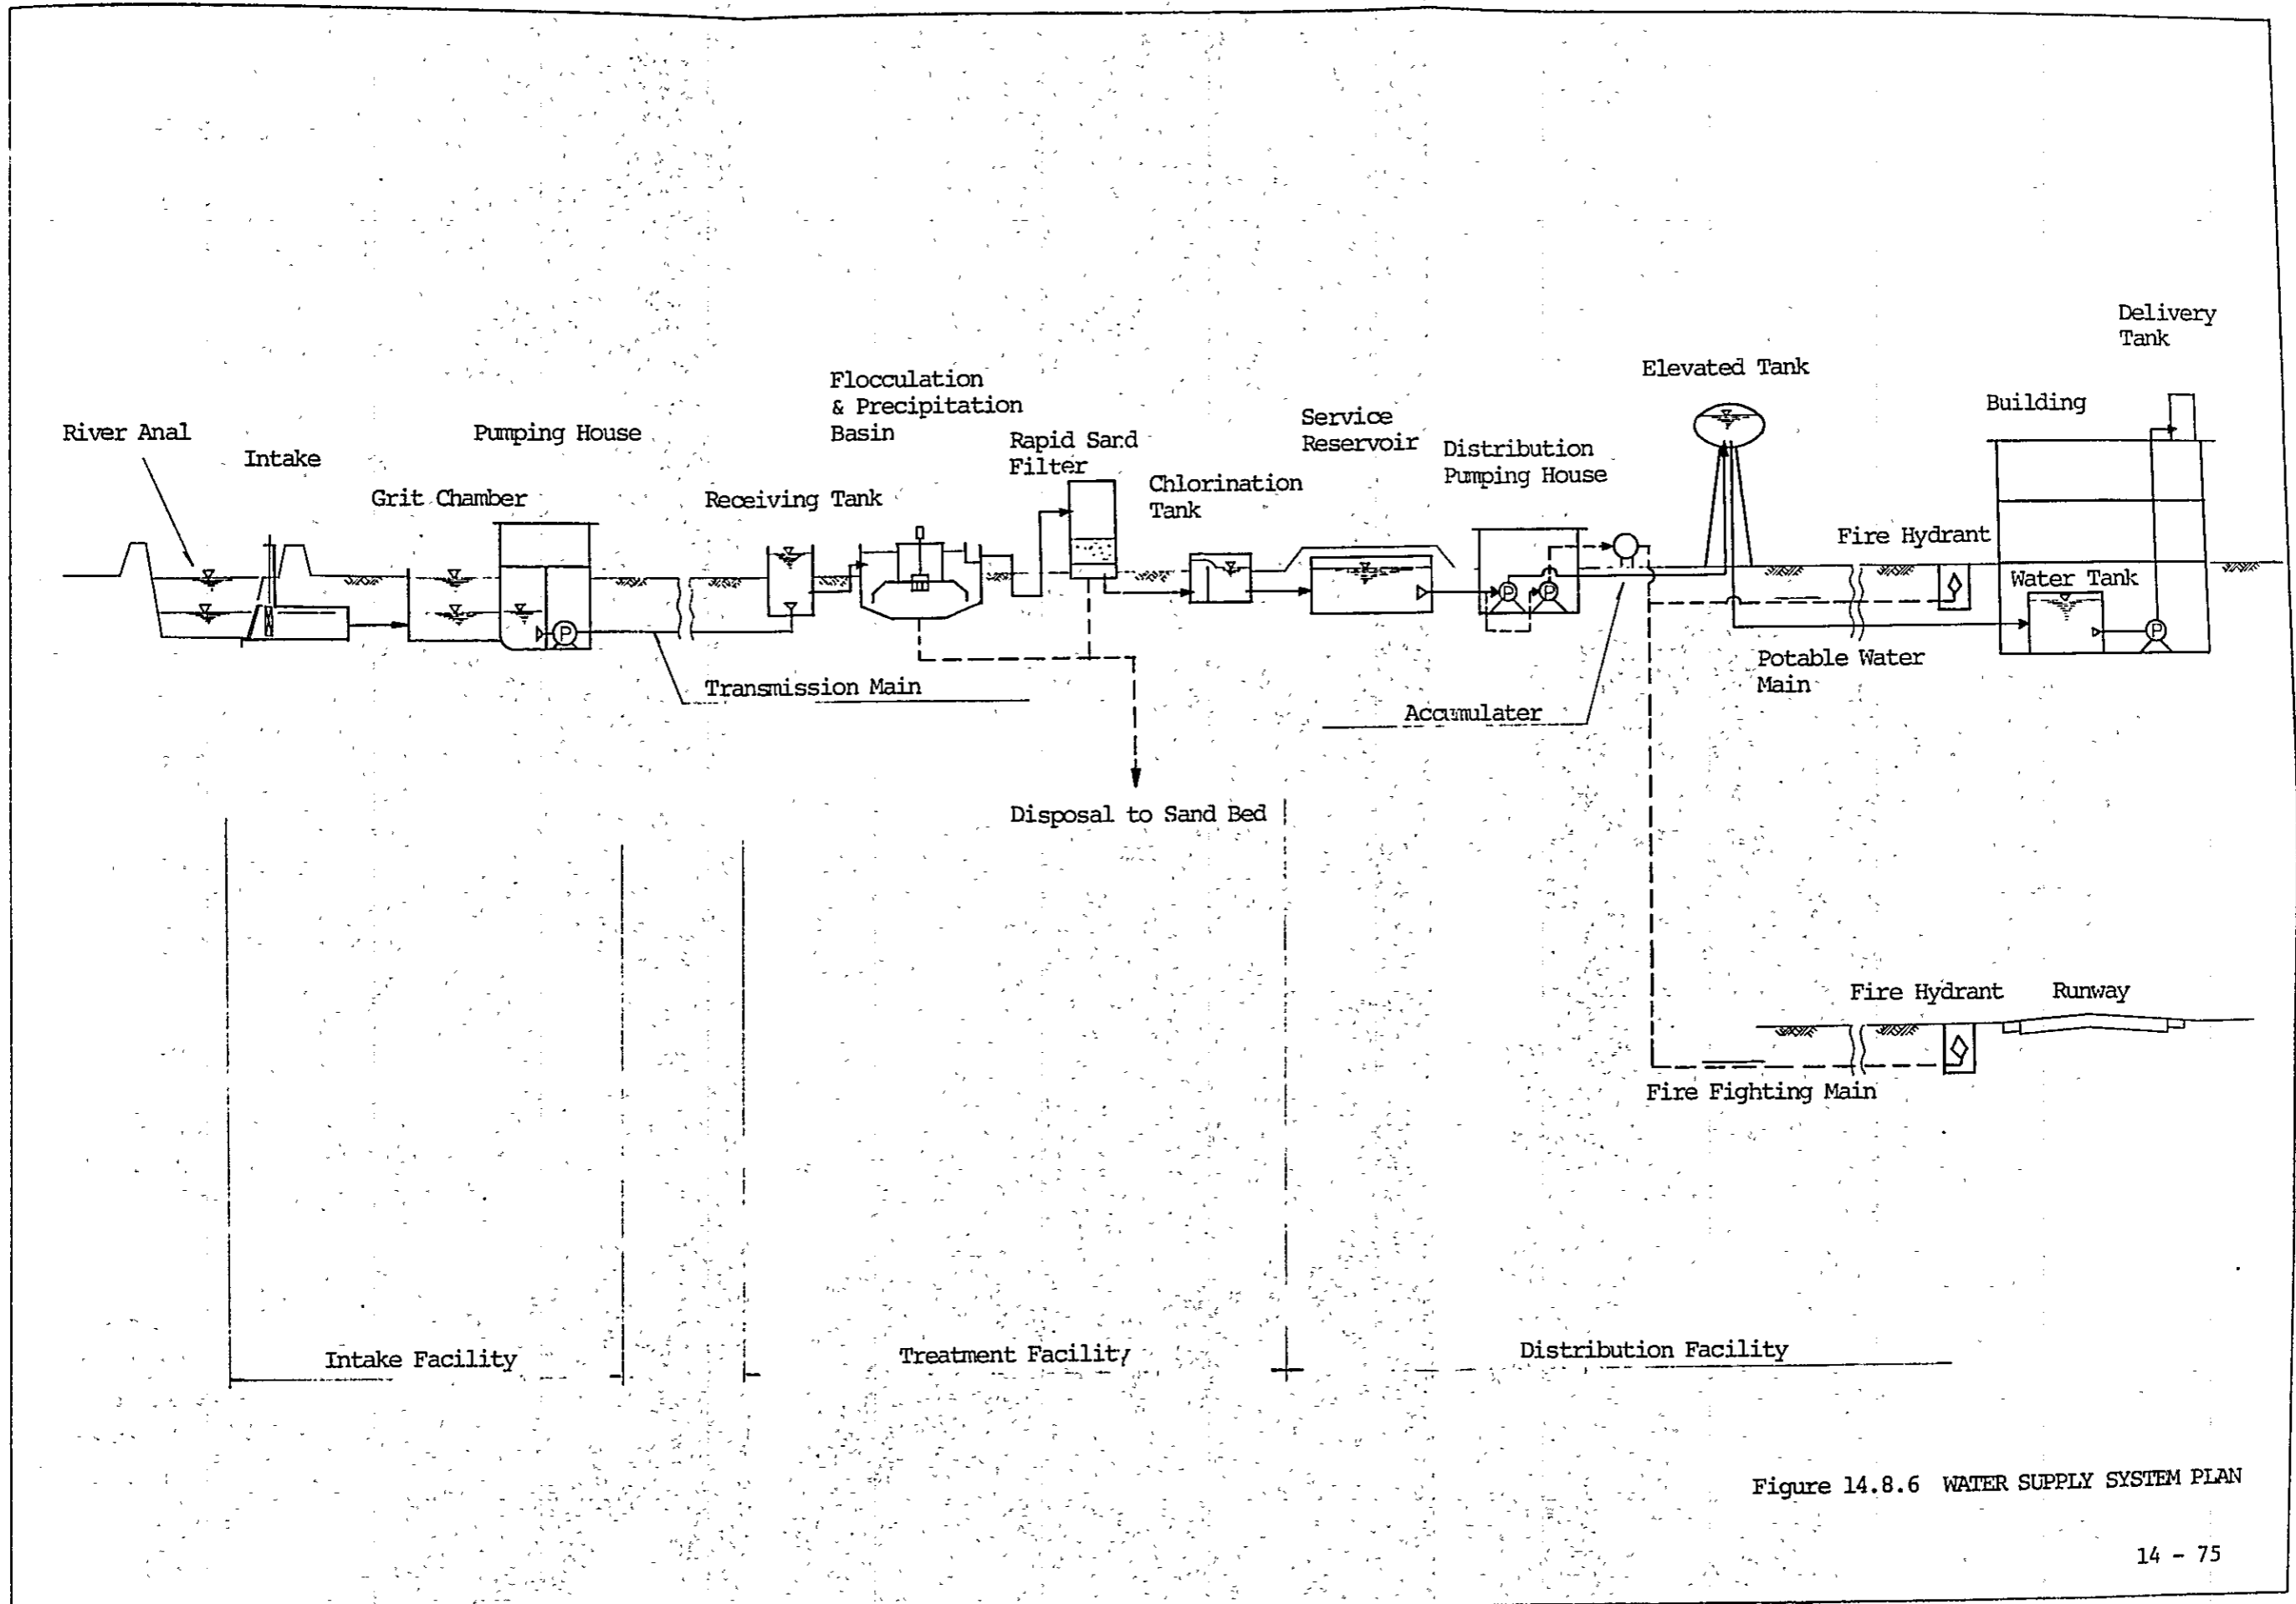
WATER SUPPLY SYSTEM PLAN
